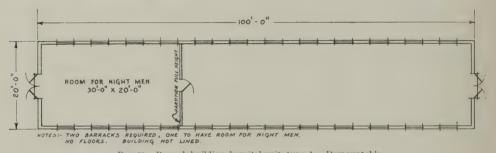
Barrack building, hospital unit, type Λ . Demountable
